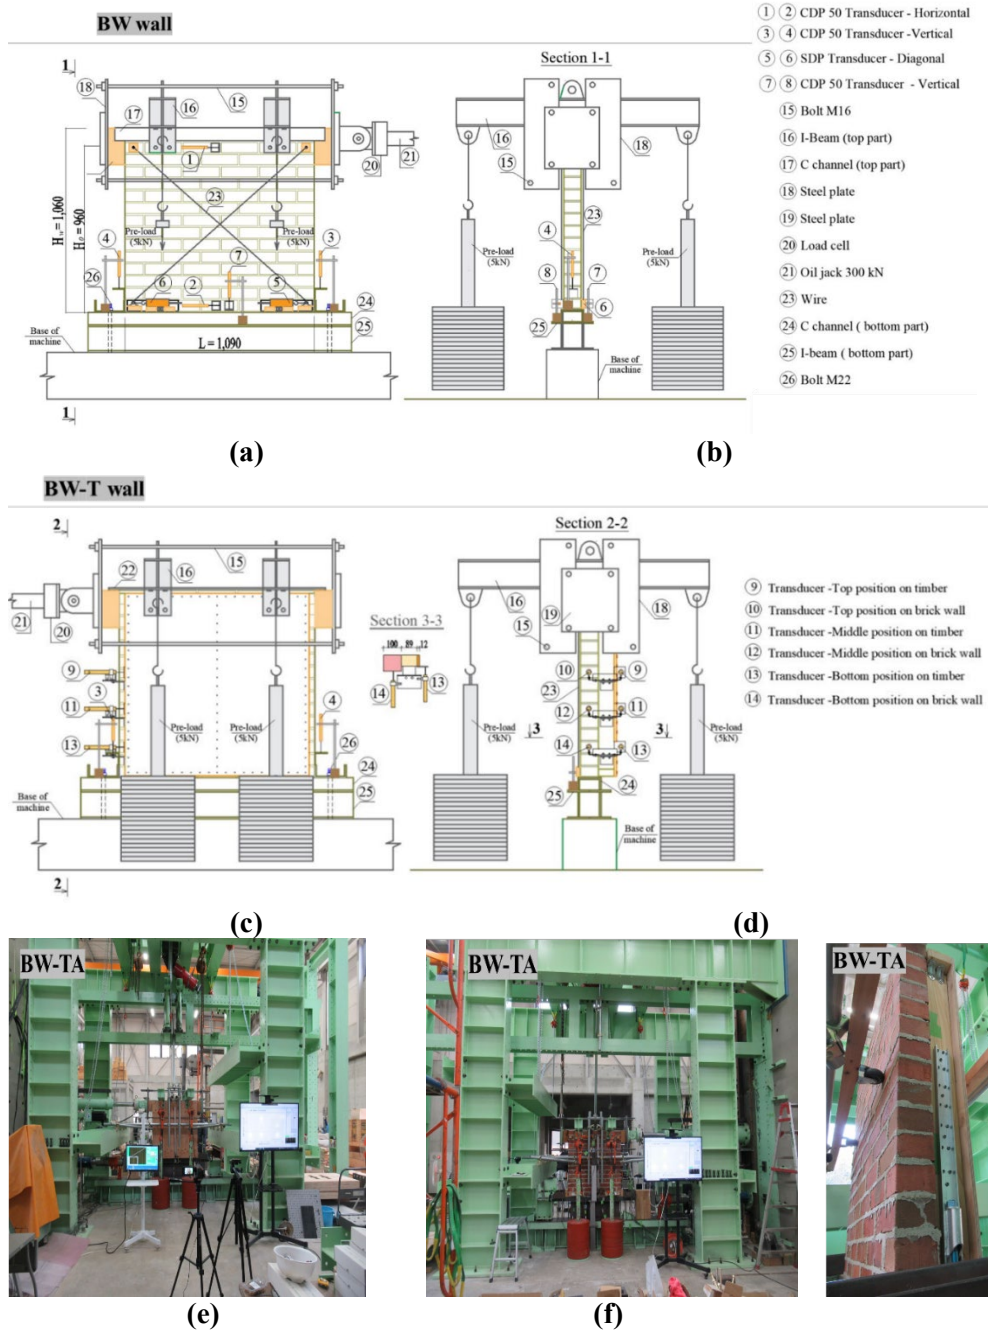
Test set-up for wall specimens. (a) Schematic view of back side (BW wall); (b) Elevation view (BW wall); (c) Schematic view of front side (BW-T wall); (d) Schematic view of
